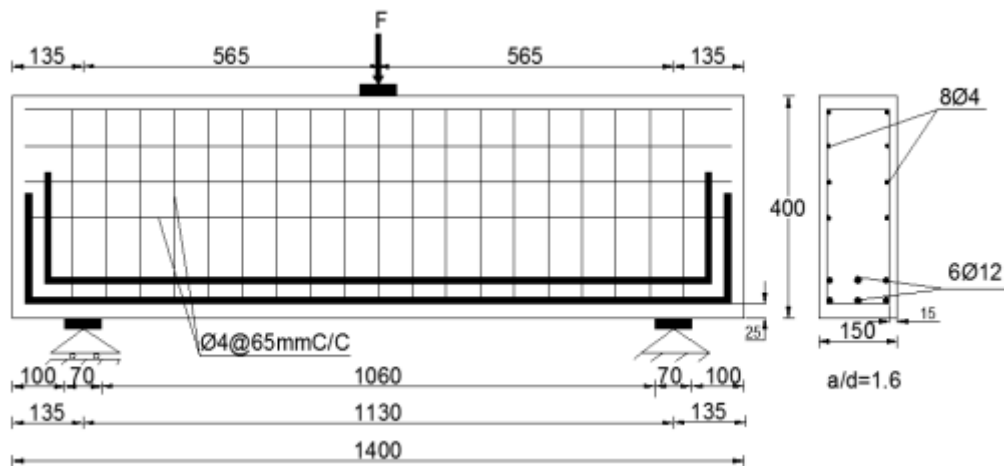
Details of specimen B.1F (all dimensions are in mm)
